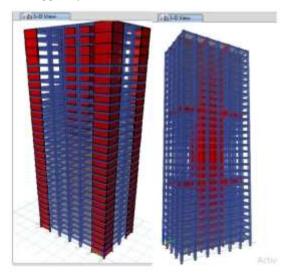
Shear Wall System 30 Floors & Outrigger System 30 Floors
